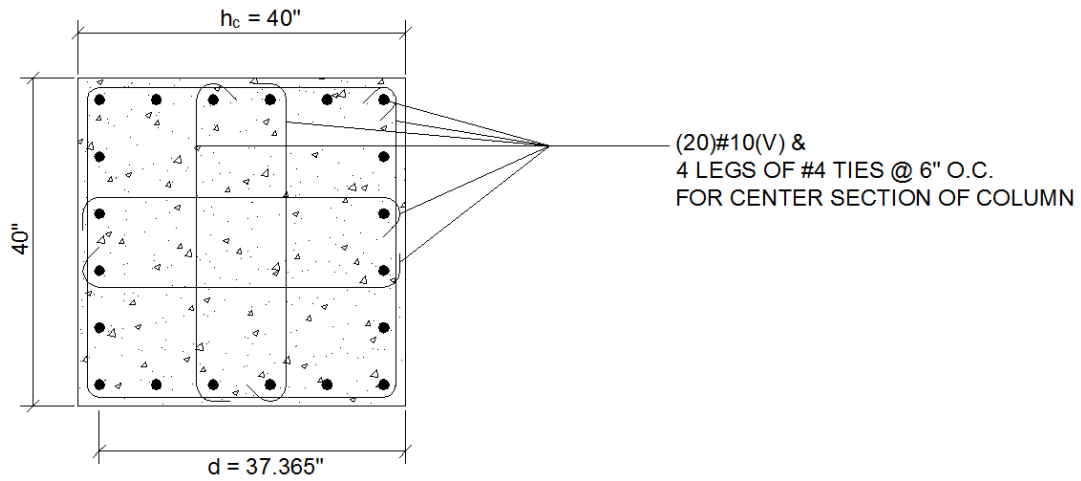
Exterior column, cross-section at center section of column at the 3rd floor level based on tsunami design requirements.
